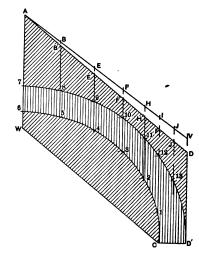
Outside Face of Plank, Showing Development of Fal-ing Mold as Required at that Surface.
